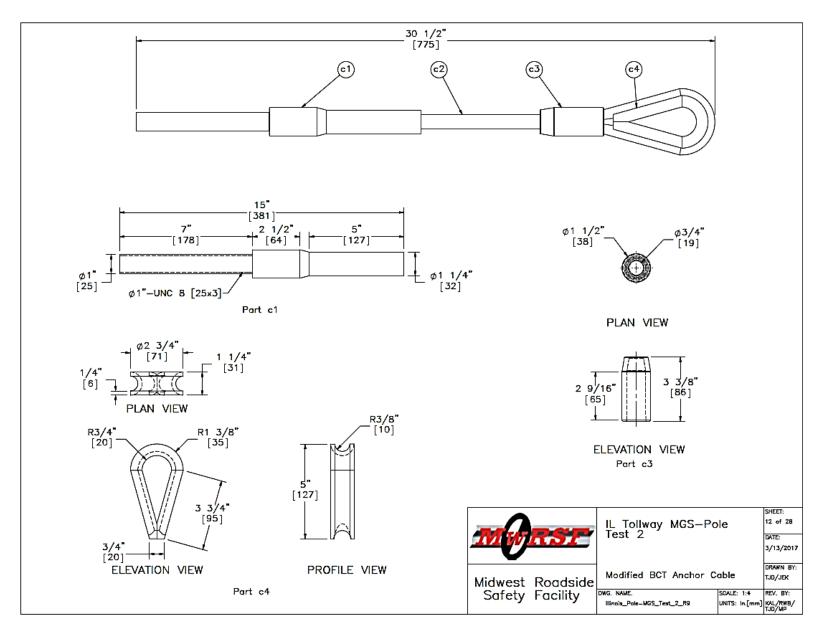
Modified BCT Anchor Cable, Test No. ILT-2
